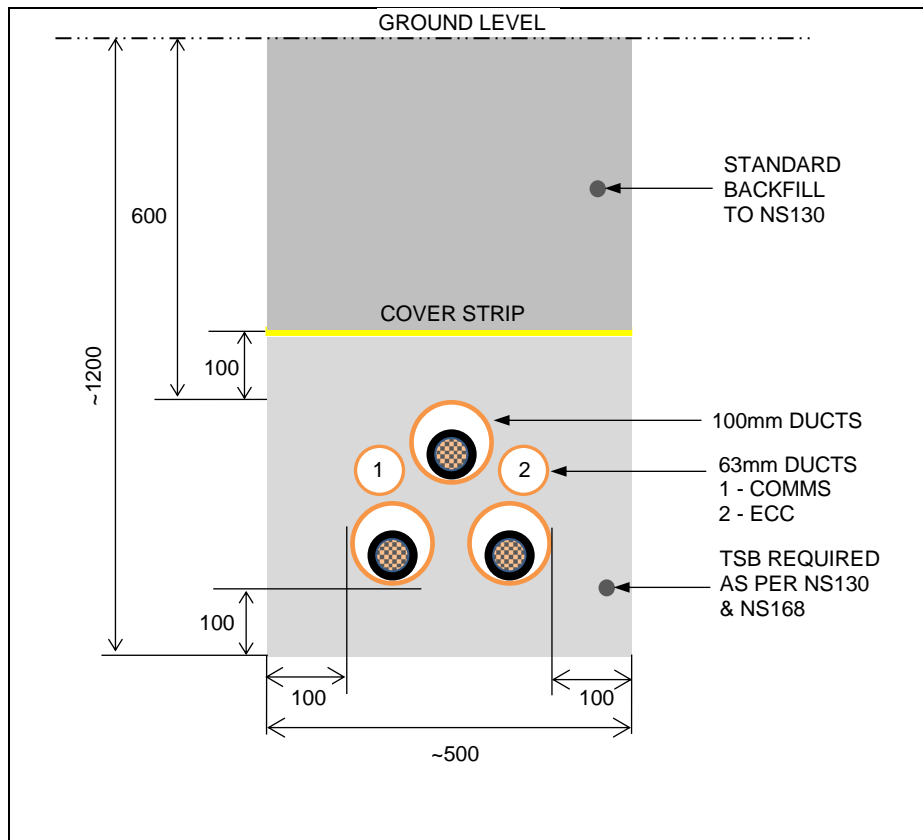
Typical trench cross section - single circuit 33kV supplying kiosk substation
